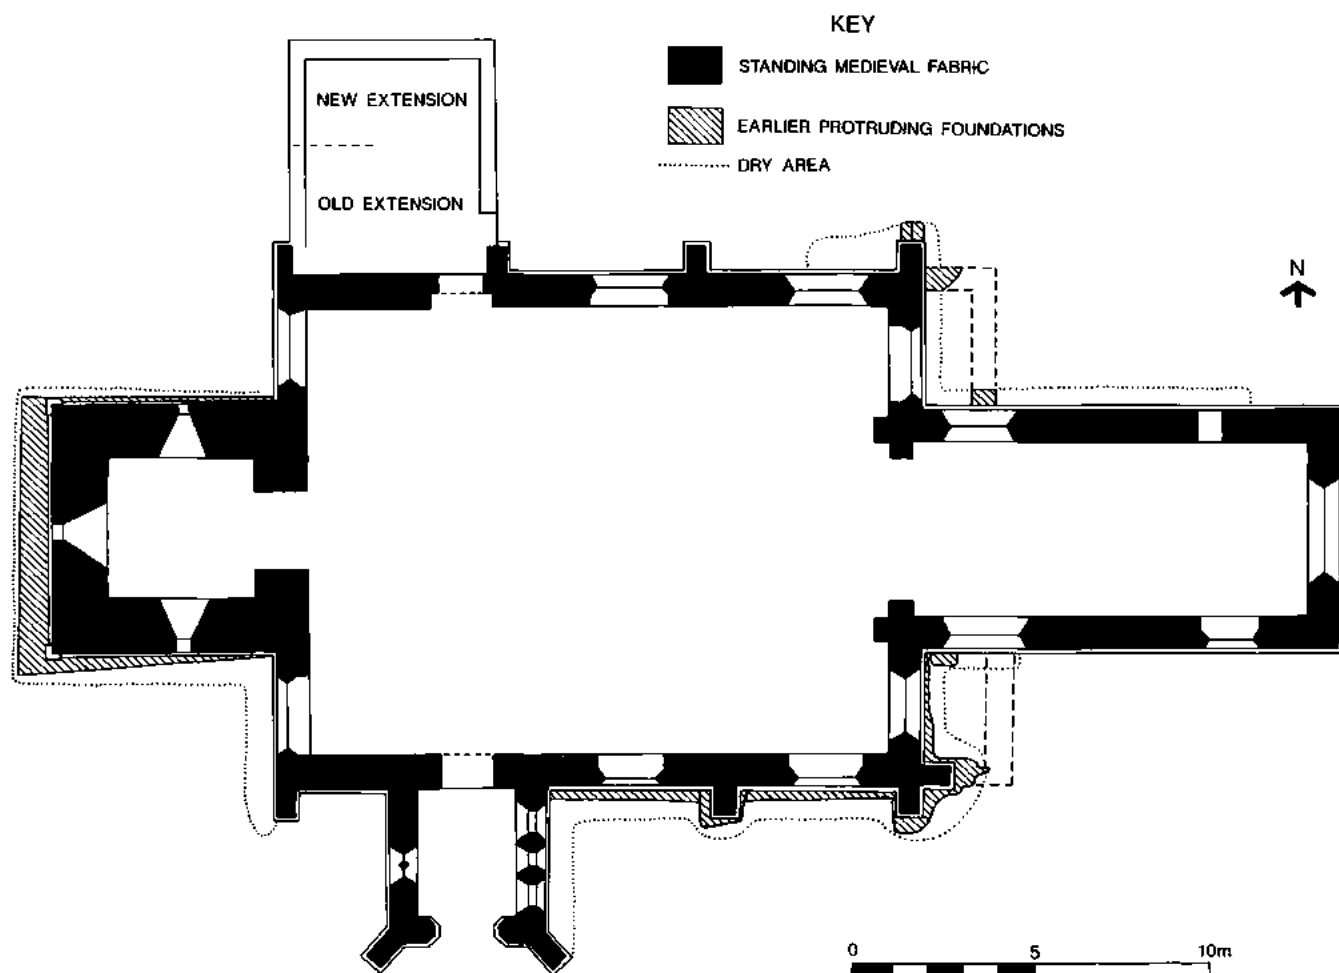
Great Bardfield church. Plan showing the excavated dry area.
